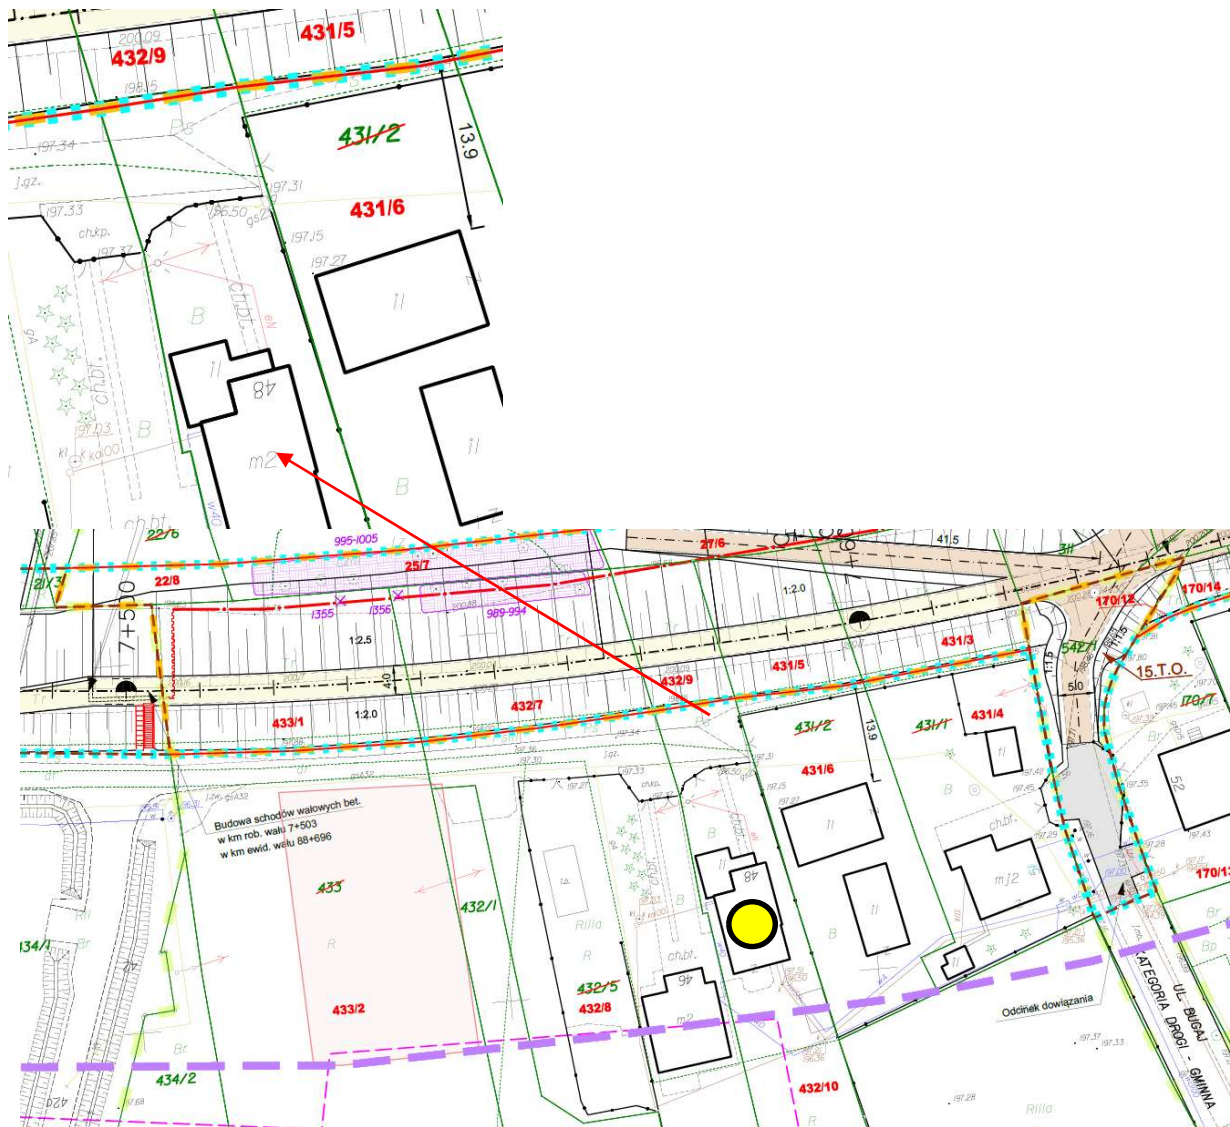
Site development plan showing the situation before the investment and the planned division (red line – dividing line, yellow dot marks the PAP's property) – general view and close-up.
